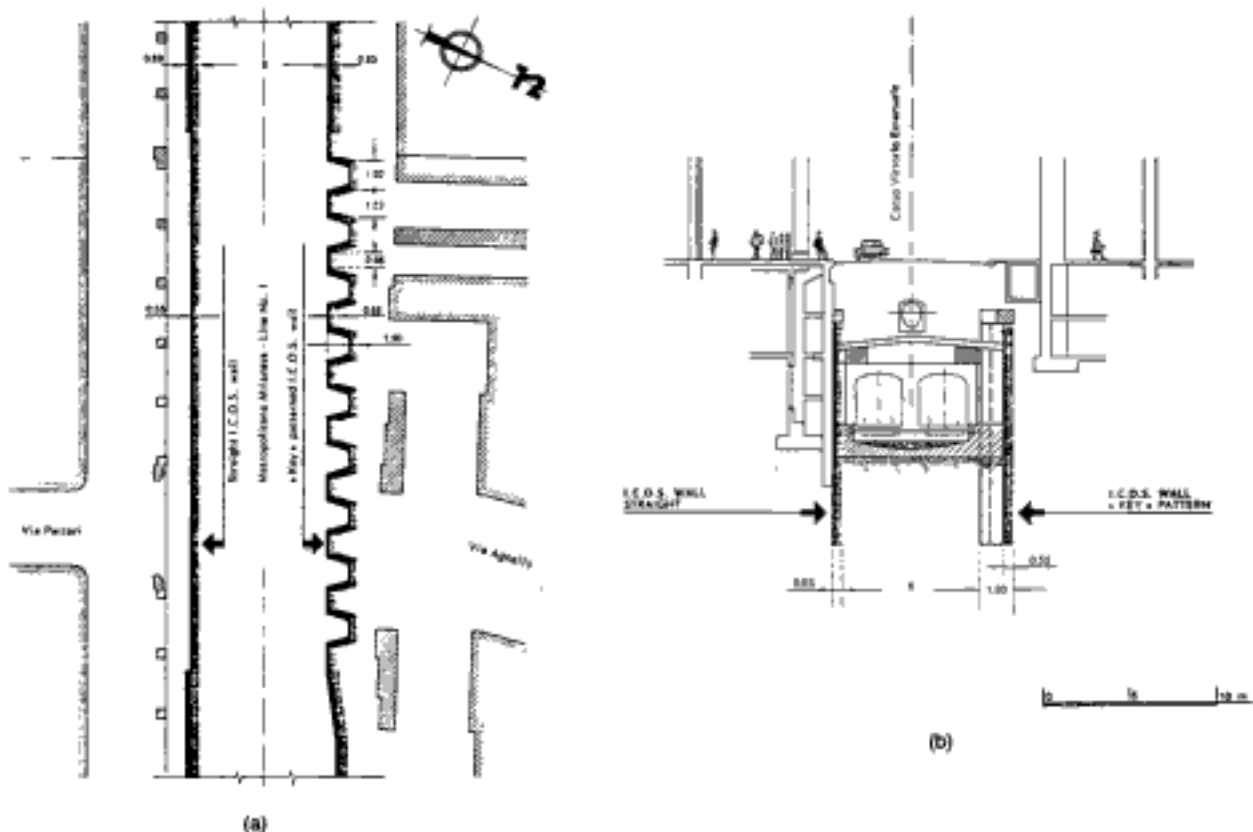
Cut-and-cover construction using castellated plan shape diaphragm walls on one side: (a) plan; (b) cross-section (courtesy of Icos)
